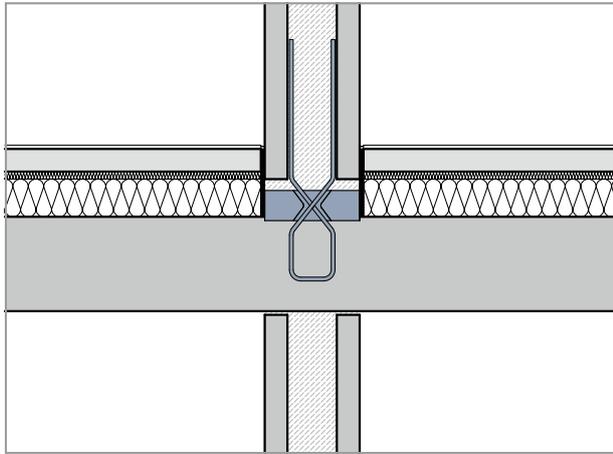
Schematic diagram Schöck Sconnex® type W with twin walls and above-slab insulation
